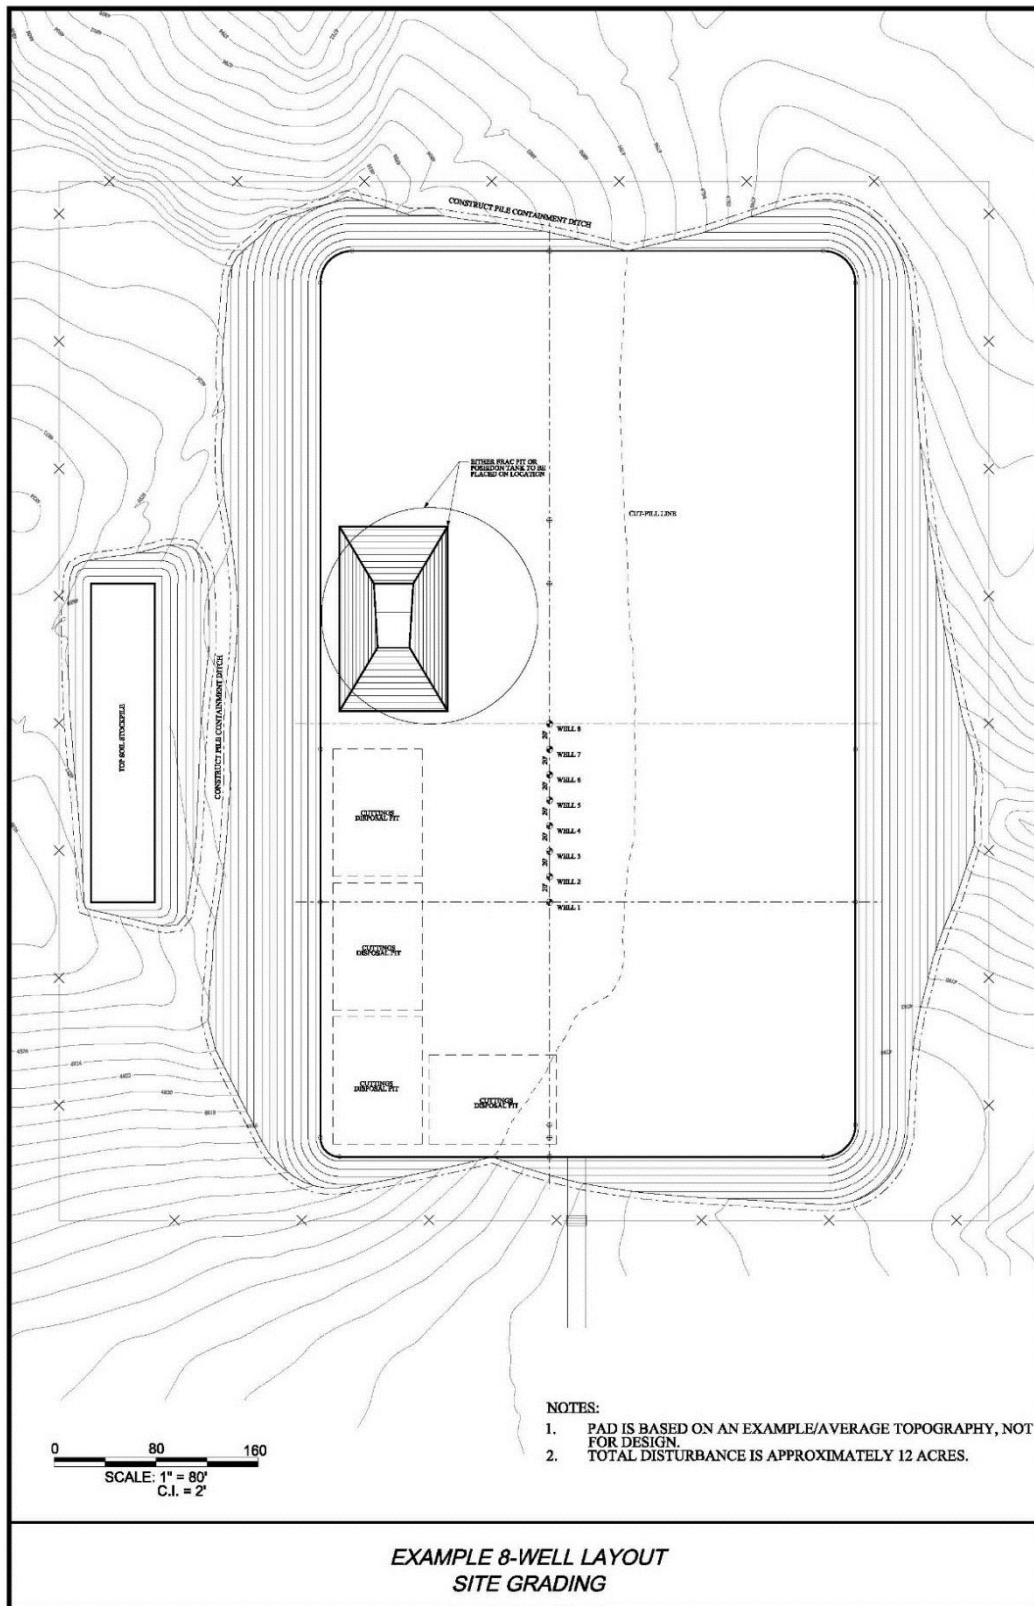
Example Drilling and Completion Horizontal Well Pad Layout (during production)
